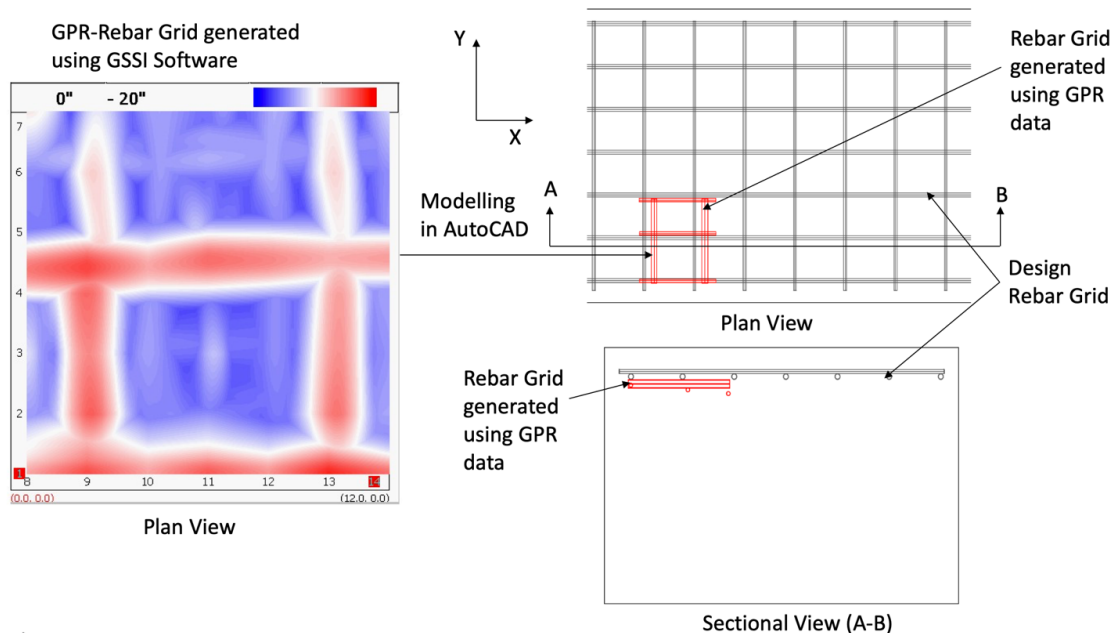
Rebar Grid generated using GPR data (RC Precast Girder at Surespan Structures)
